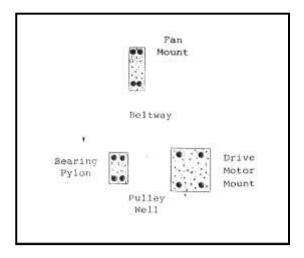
The plan view at right depicts a typical concrete foundation for a ventilation blower and its drive motor. Source: Author.
